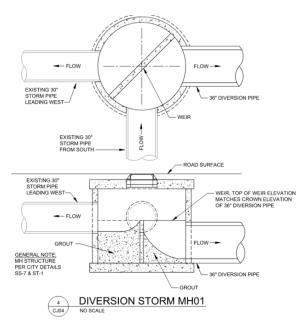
Exhibit D: Record drawings include a detail further confirming the Lake Street diversion plan, profile, and schematic discussed above. A permanent concrete weir structure controls primary and secondary stormwater flows
